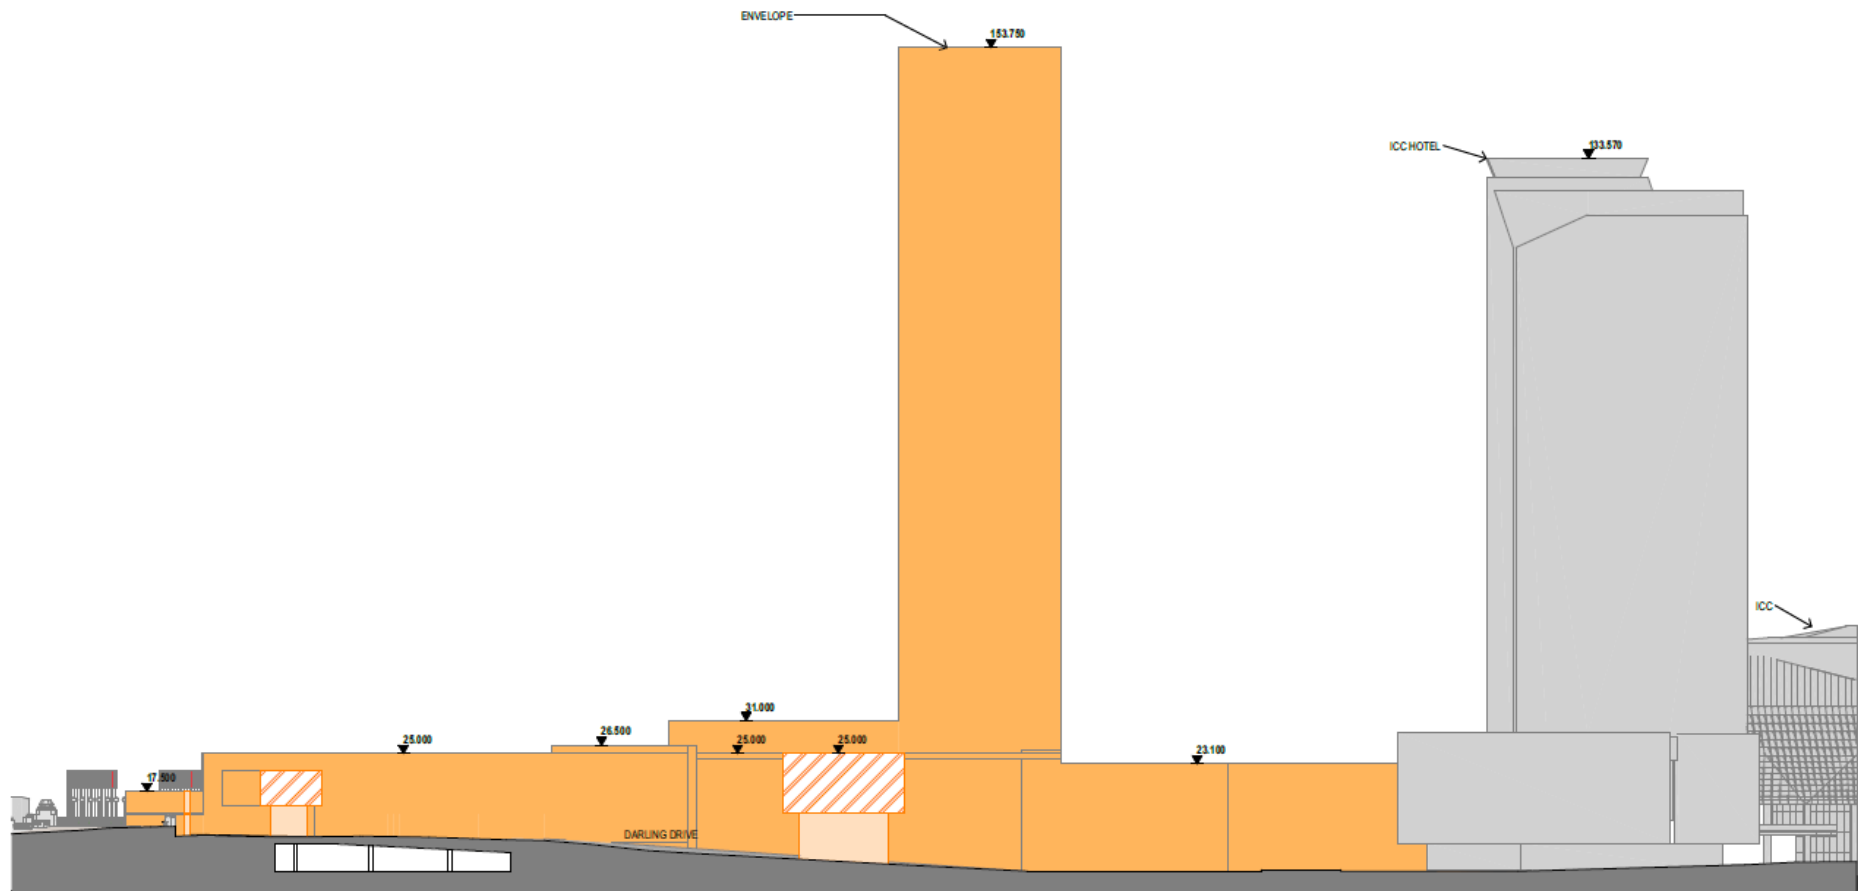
Envelope West Elevation (Source: FJMT, 2020)
